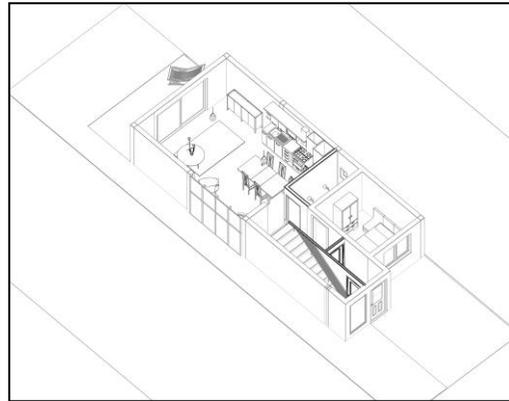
Ground floor 3D plan in stage two – bold lines show created elements
